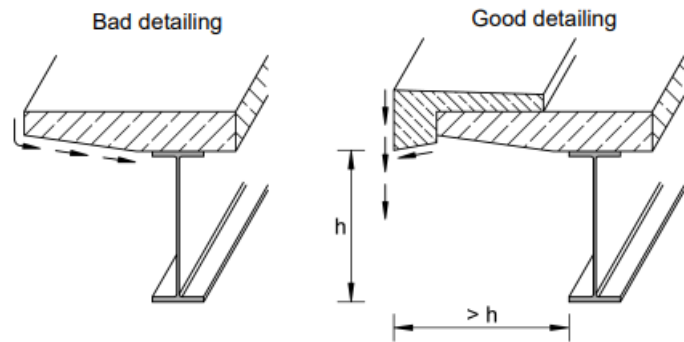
Drip details at the caps or edges of concrete decks and overhang (Ungermann & Hatke, 2021)
